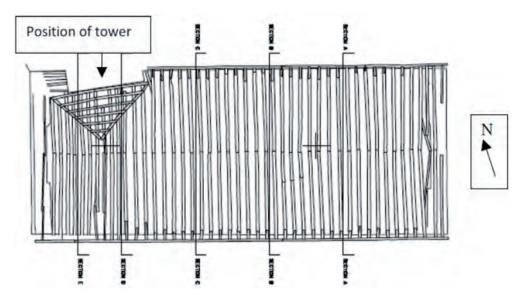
Chapel roof plan (copyright Warner Land Surveys, 2014).
